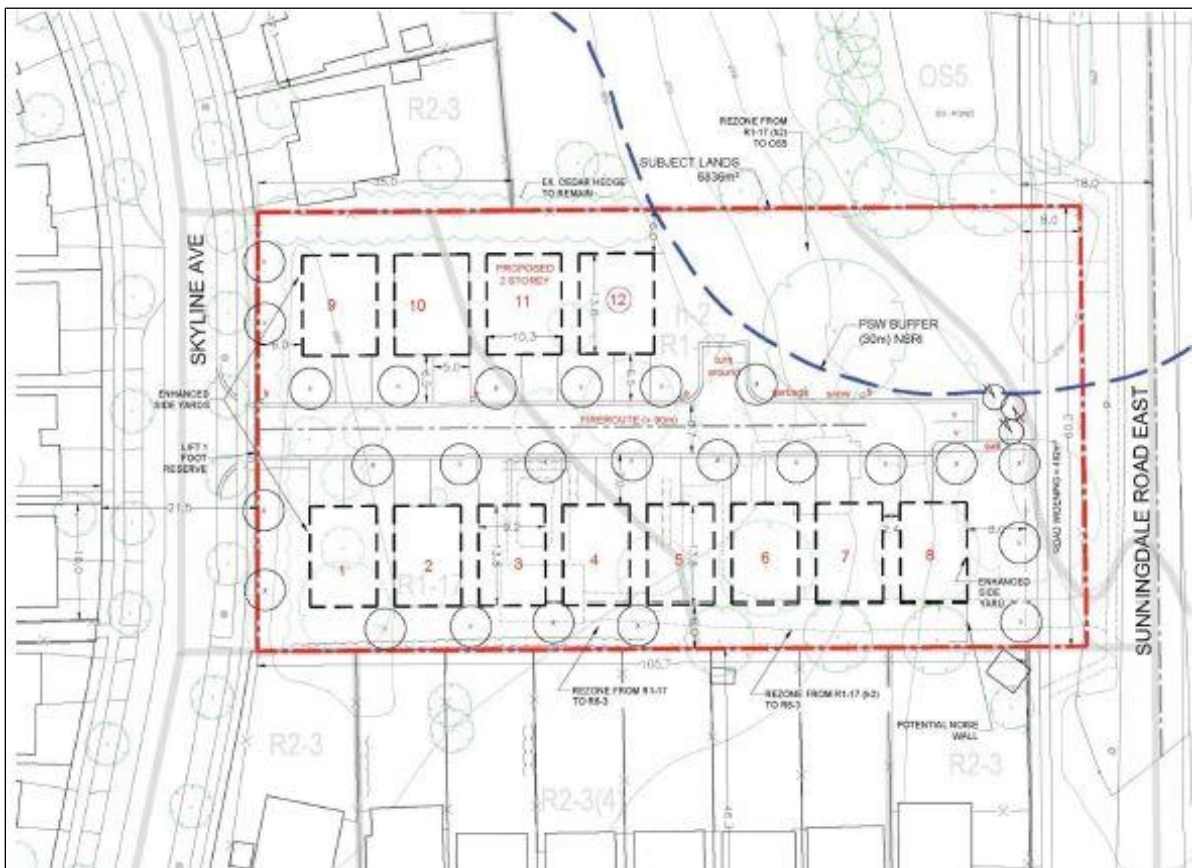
Potential Development Plan for 307 Sunningdale Road East.
